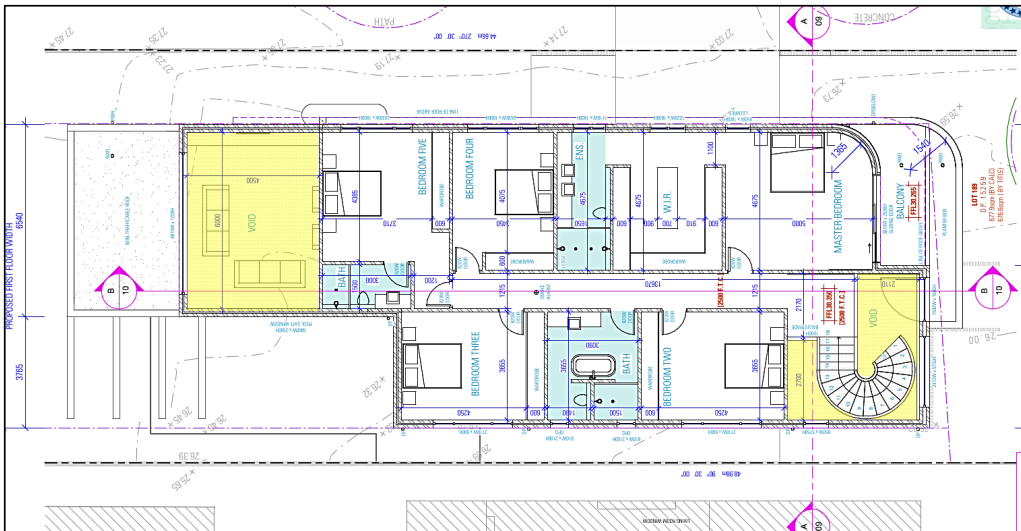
First Floor Plan showing locations of proposed voids (highlighted in yellow)
